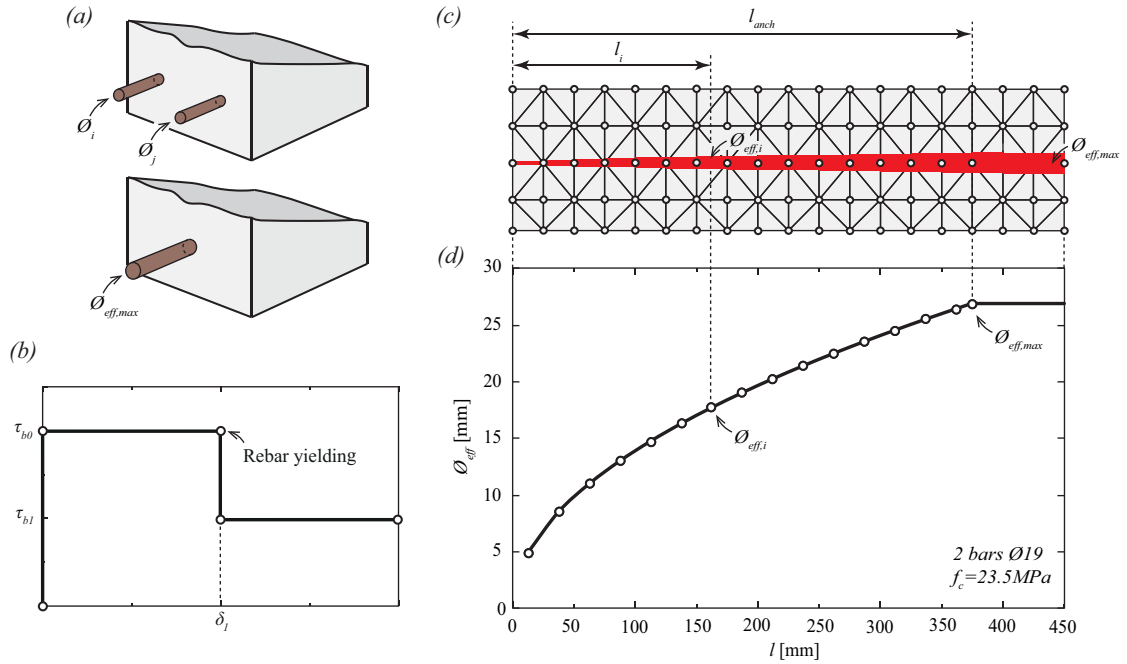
Modelling rebars with insufficient reinforcement anchorage using EPSF approach: (a) actual and effective rebars introduced to EPSF model; (b) concrete-to-steel bond stress; (c) varying bar FE area over rebar's anchorage length; (d) effective bar diameter representing two Ø19 rebars imbedded in 23.5 MPa concrete accounting for their actual anchorage length
